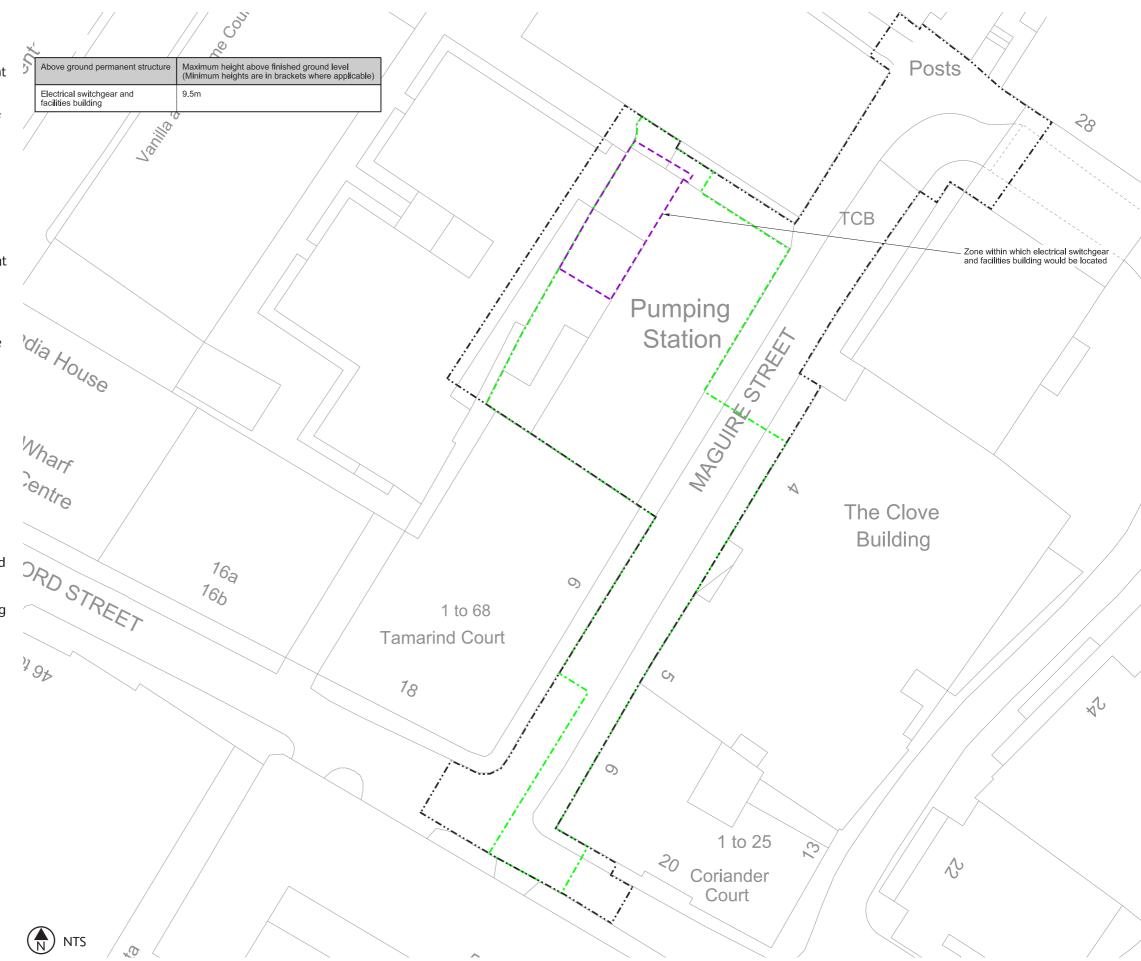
Site works parameter plan - refer to Site works parameter plan in the *Book of Plans
